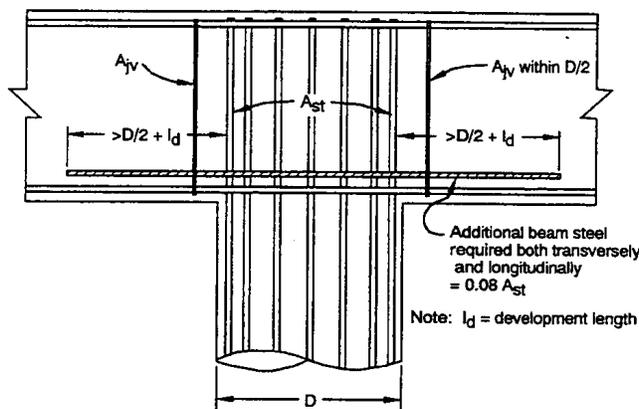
Additional cap beam bottom reinforcement for joint force transfer.
